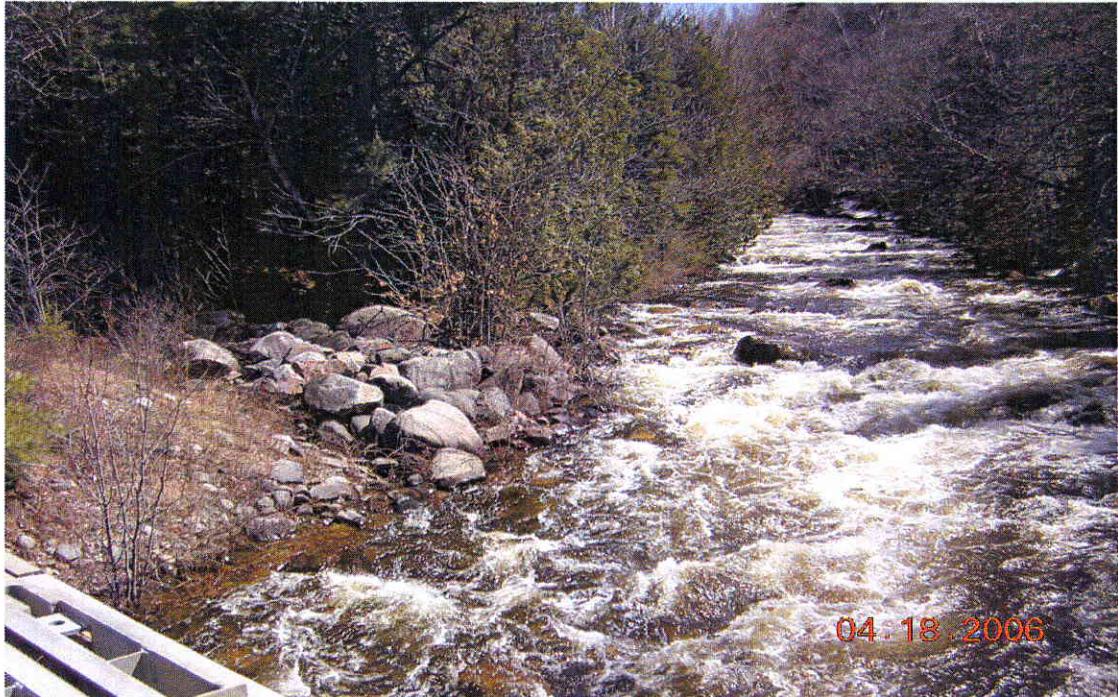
Rapid River upstream, to the east, of the existing bridge.
